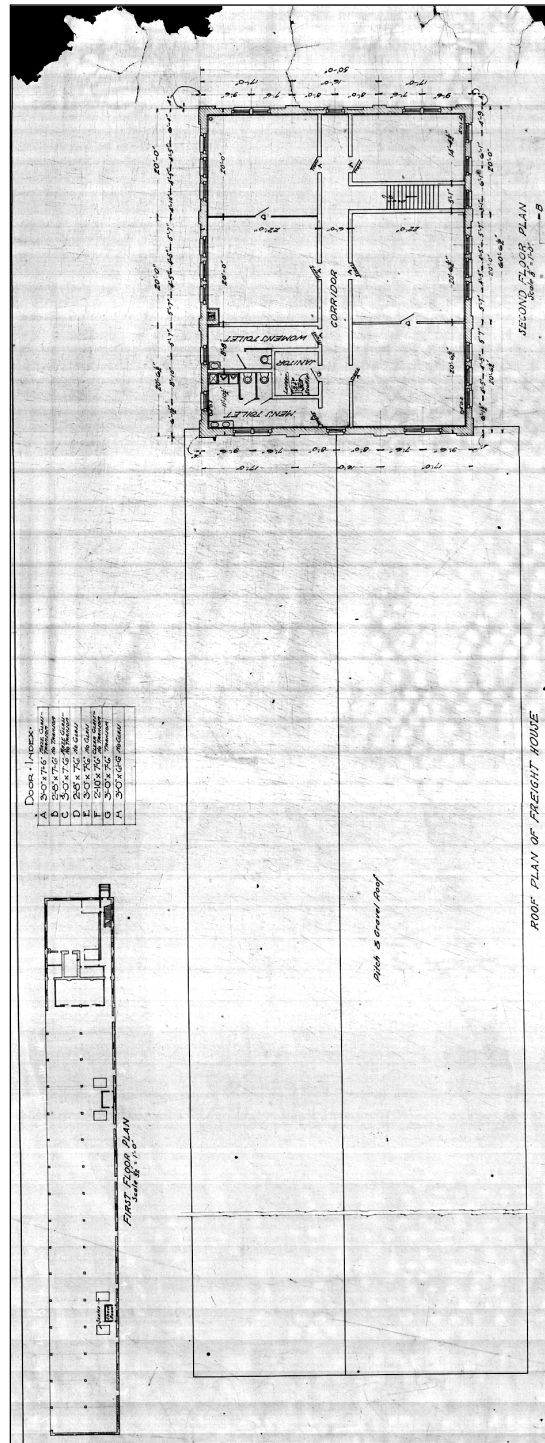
Midland Railway Building, 200 Isabel Street, “Second Floor and Roof Plans,” architect’s plans #2410/1911. (City of Winnipeg, Records Management Division.)
